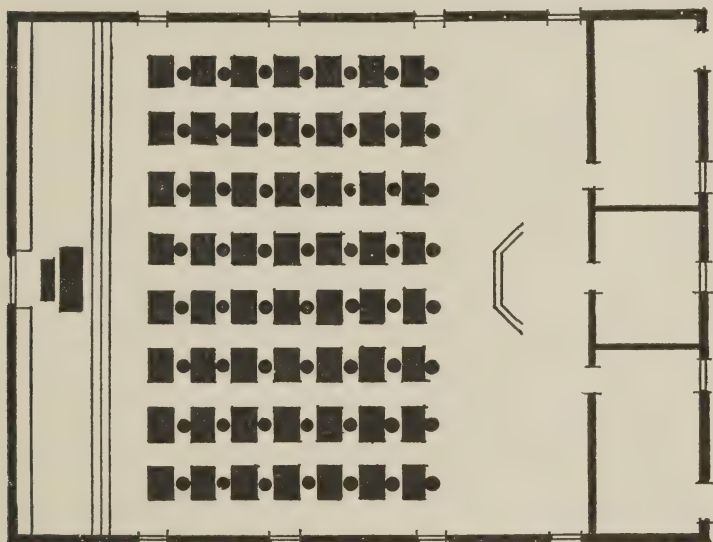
One-room school floor plan recommended by Dr. W. A. Alcott in 1830.
